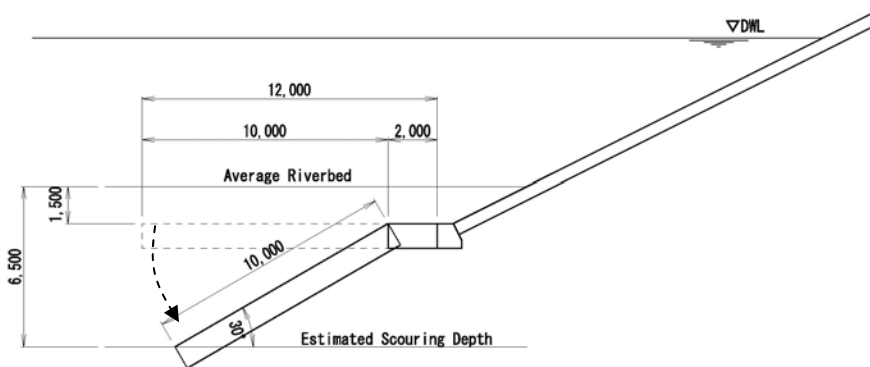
Proposed Method of Connecting Concrete Blocks
